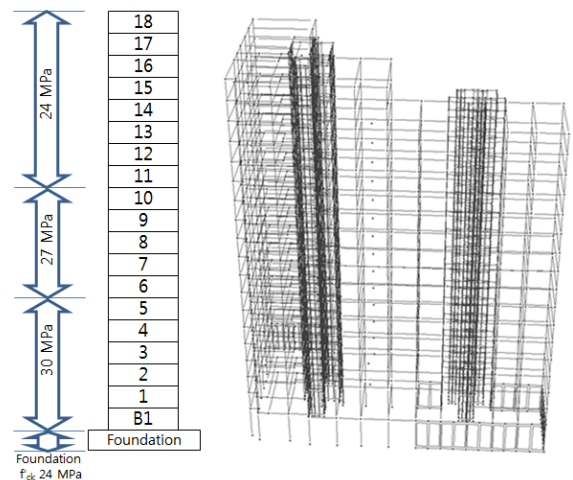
Division of concrete material strength and Full Scale 3D FE Model for the apartment building
